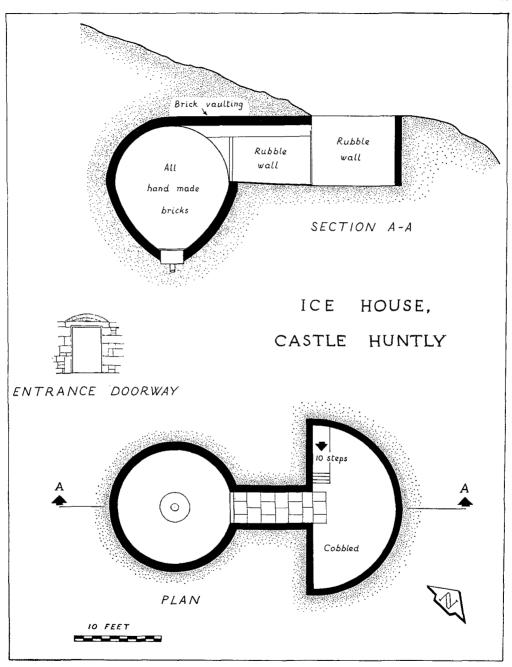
Plan and section of the Ice-House at Castle Huntly
